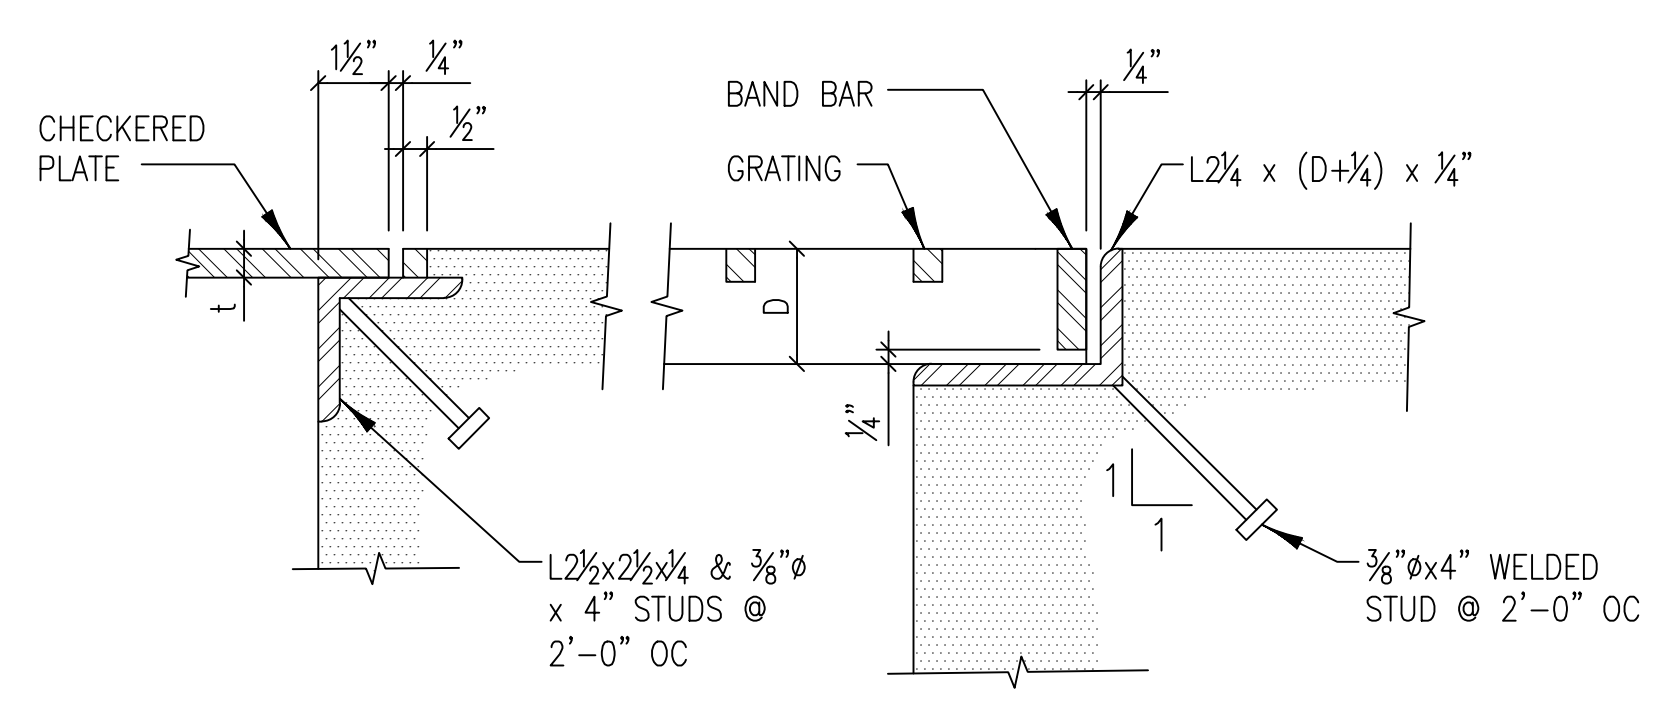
DETAIL - DEPRESSION IN SLAB LESS THAN OR EQUAL TO SLAB THICKNESS
